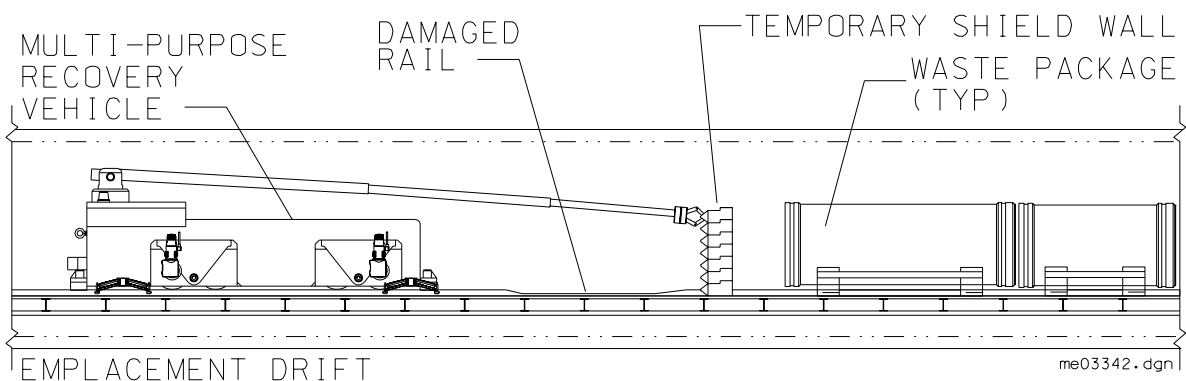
MRV Constructing Temporary Shield Wall
